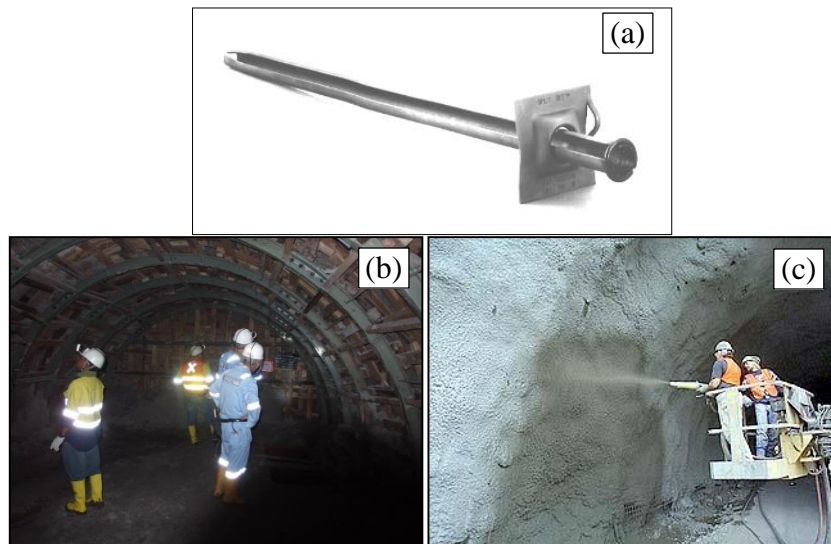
Support systems for main roadway (a) friction rockbolt (b) steel arch (c) shotcrete.
